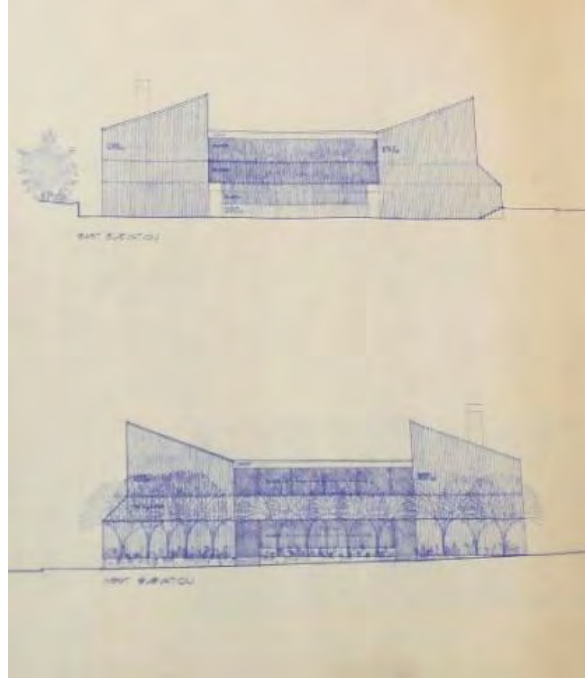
Plan for “B Building,” Wong and Brocchini, 1973. Source: CCA Facilities Department.
